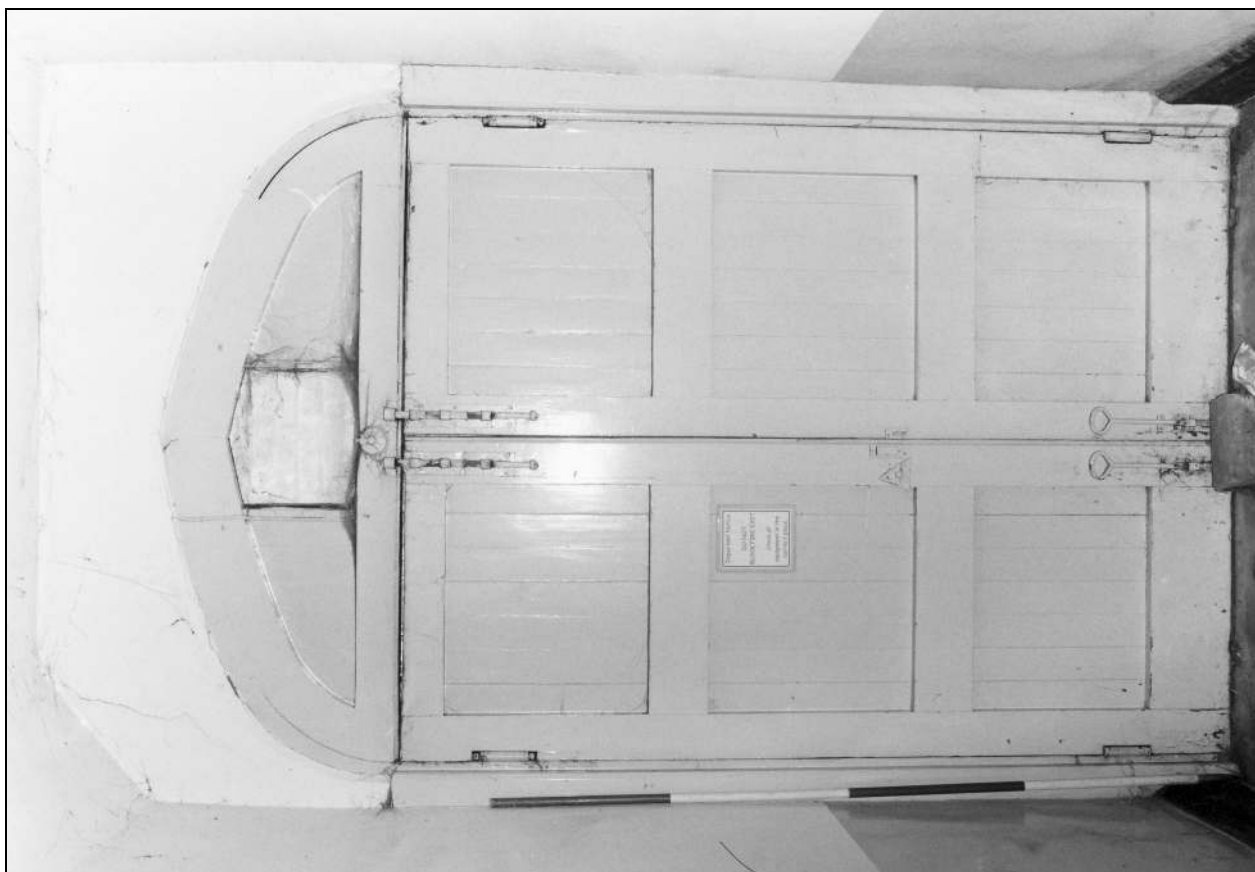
Interior view of Sunday school front doors (film 4, frame 6)
